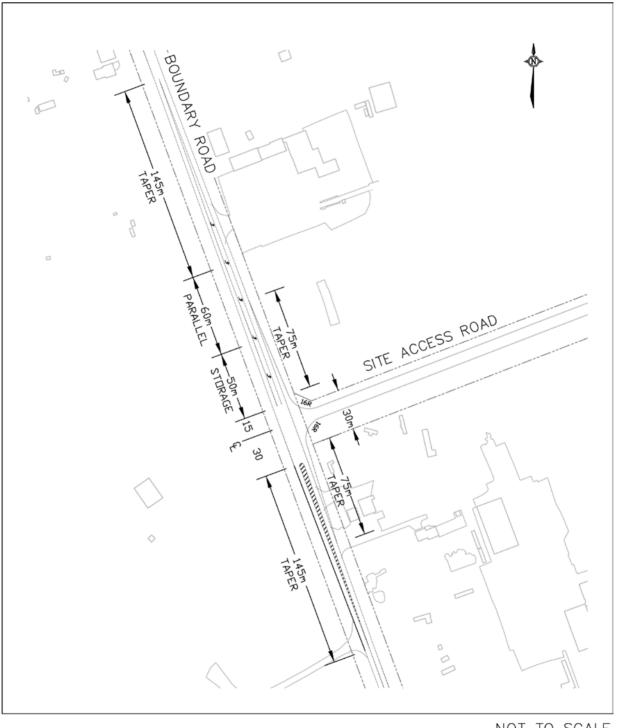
Proposed Boundary Road/Site Access Geometry
